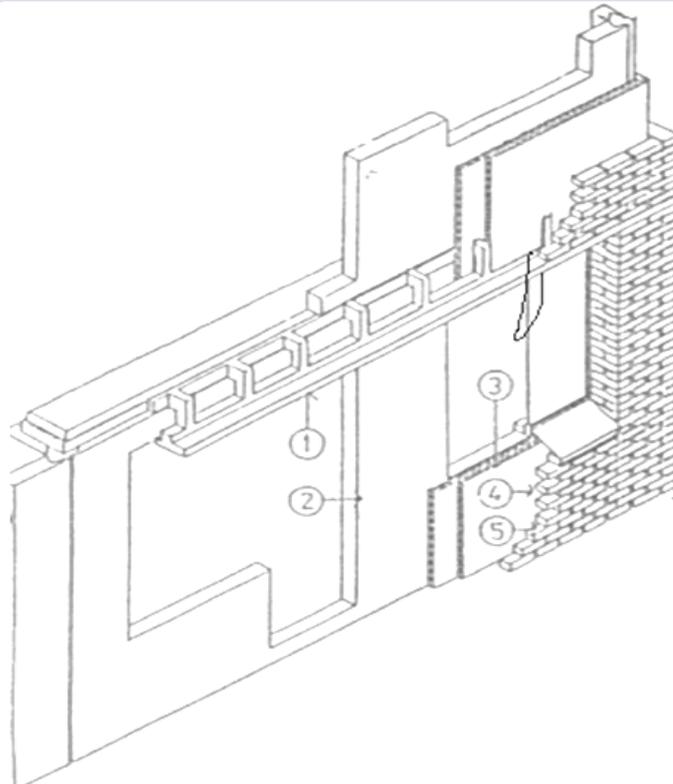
Support of facial brick layer to the ferroconcrete cantilever:
